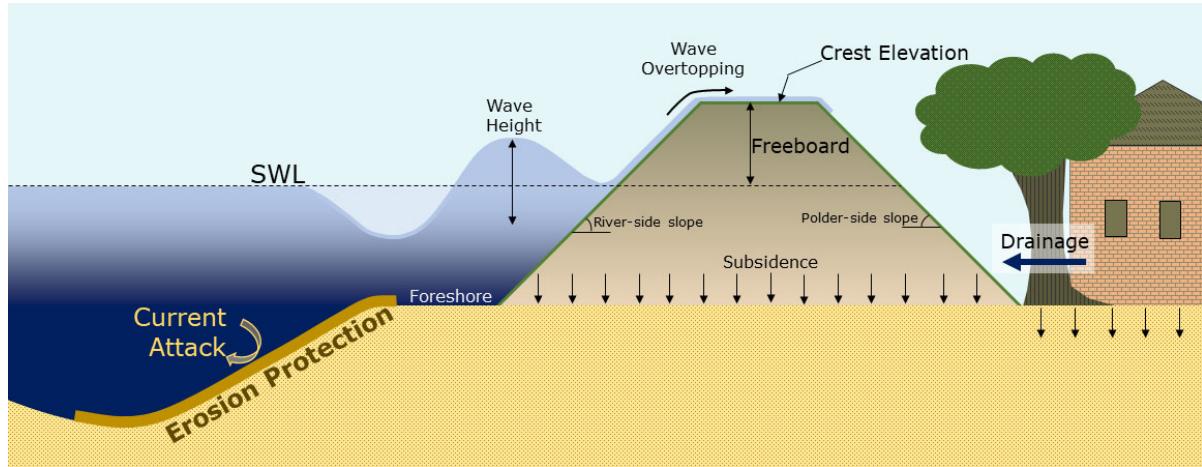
Hydraulic loads that must be considered for embankment design.
